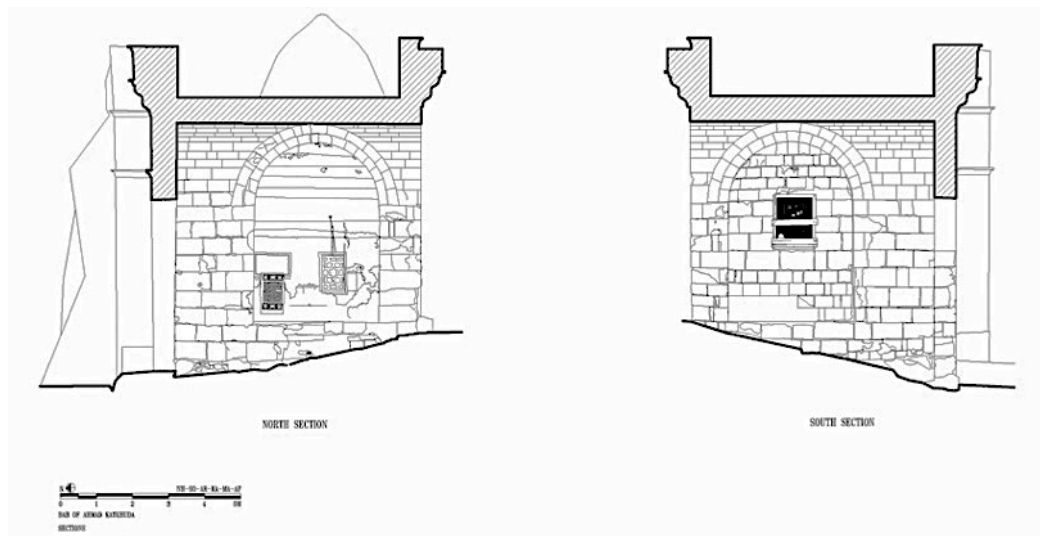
And 7. West east section looking north and south in the passageway under Ahmad Katkhuda Bab
